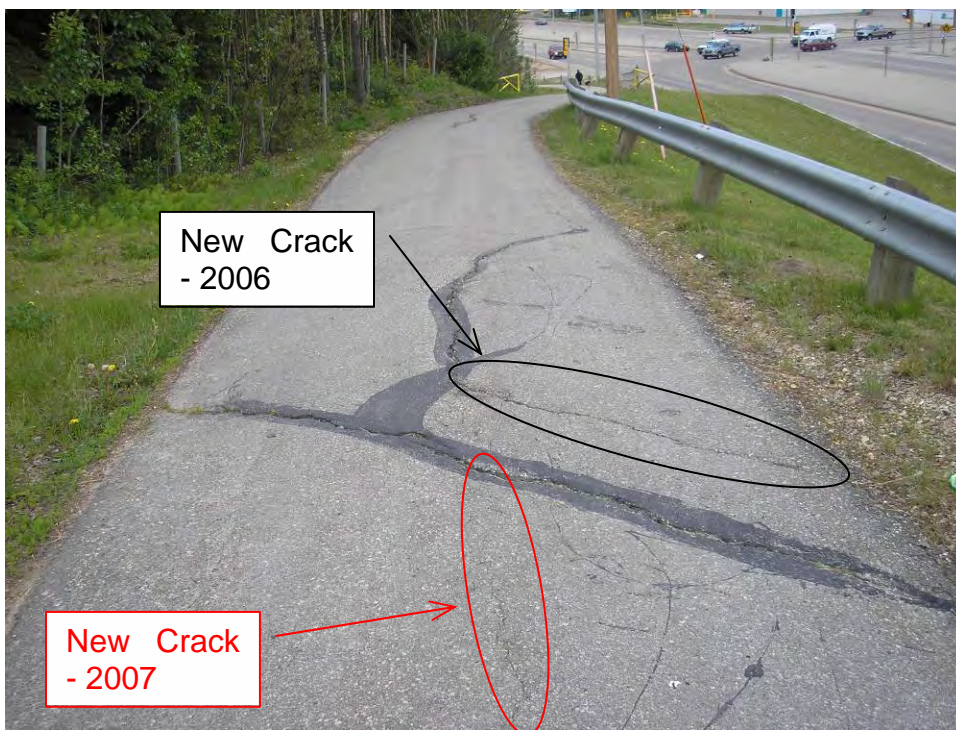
Closer view of new crack to between existing cracks, June 11, 2007.
